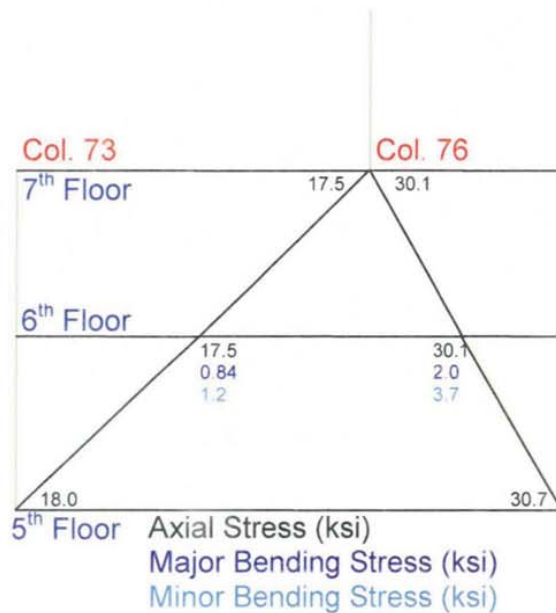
Stresses in Truss 2 diagonals taking the diagonals as having fixed connections at the top and bottom.
